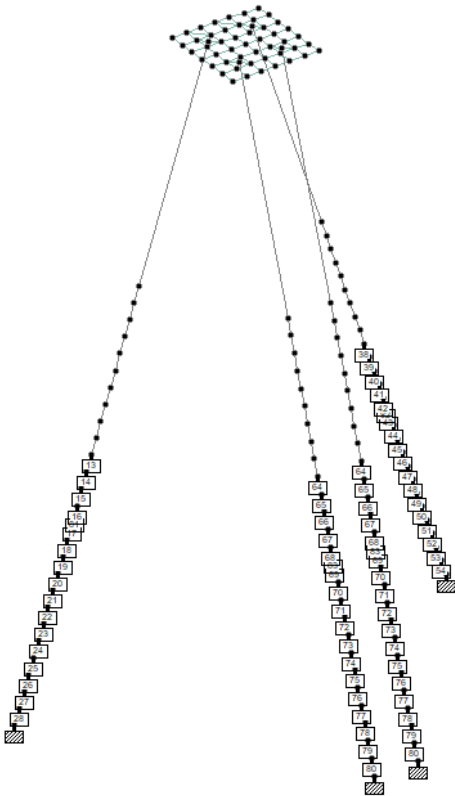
Snapshot of structural model of pontoon restraint dolphin.
